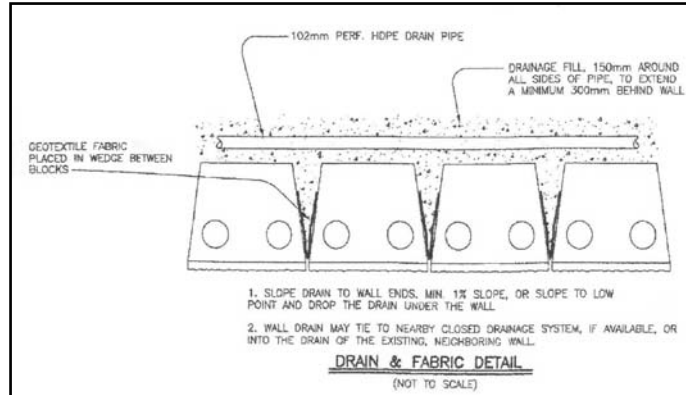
Typical geotextile placed between Blocks to prevent erosion of granular backfill.
